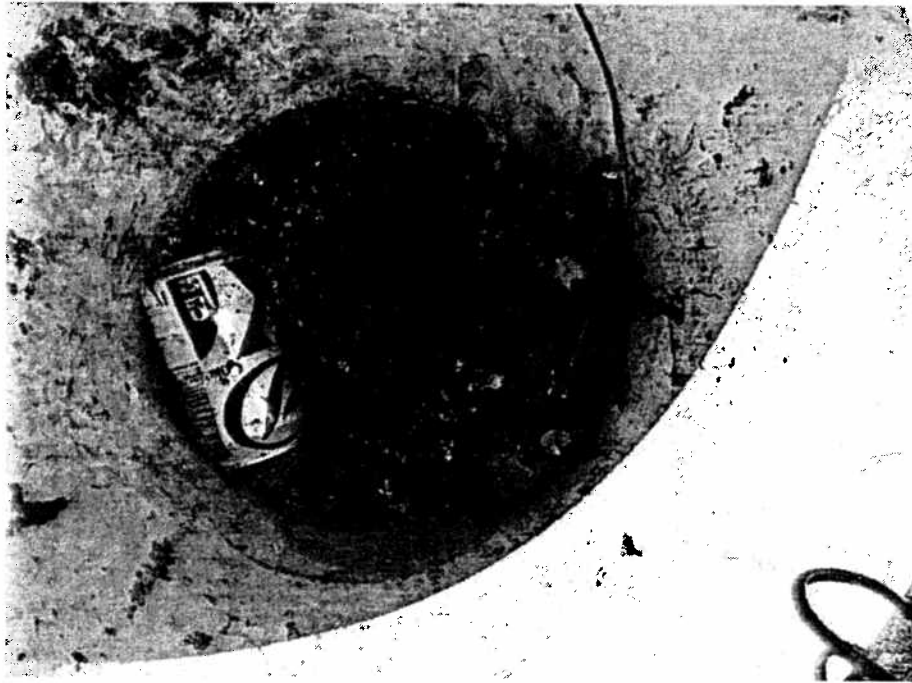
1702 Forest Road – View of overflowed sewage at residential building.
